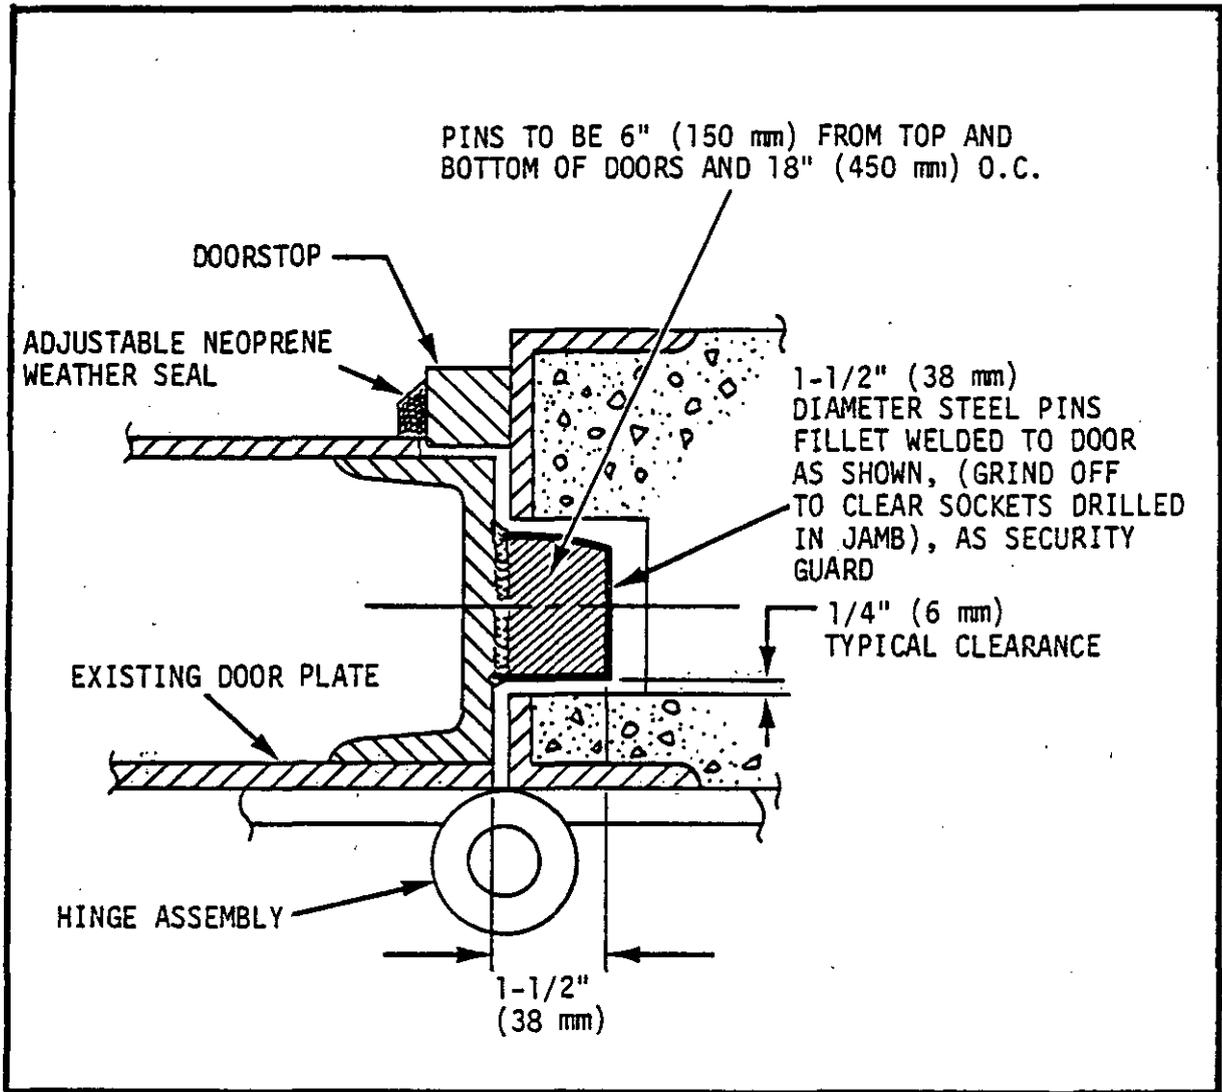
Security plan for doors using a pin-in-socket technique.
